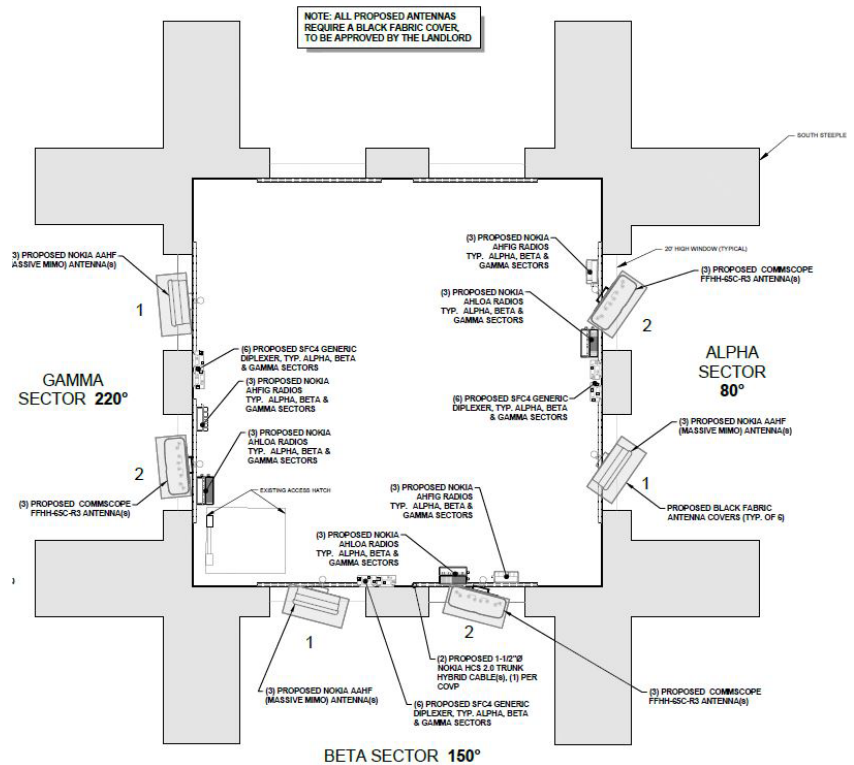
, by Applicant: Detail of South tower antenna plan, C-4, showing proposed new antennas protruding past the exterior plane of the tower wall.
